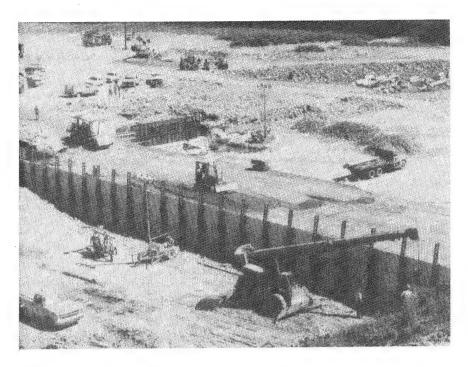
Soldier beams being used to help position precast panels, Winchester Dam (PEH Engineering)
